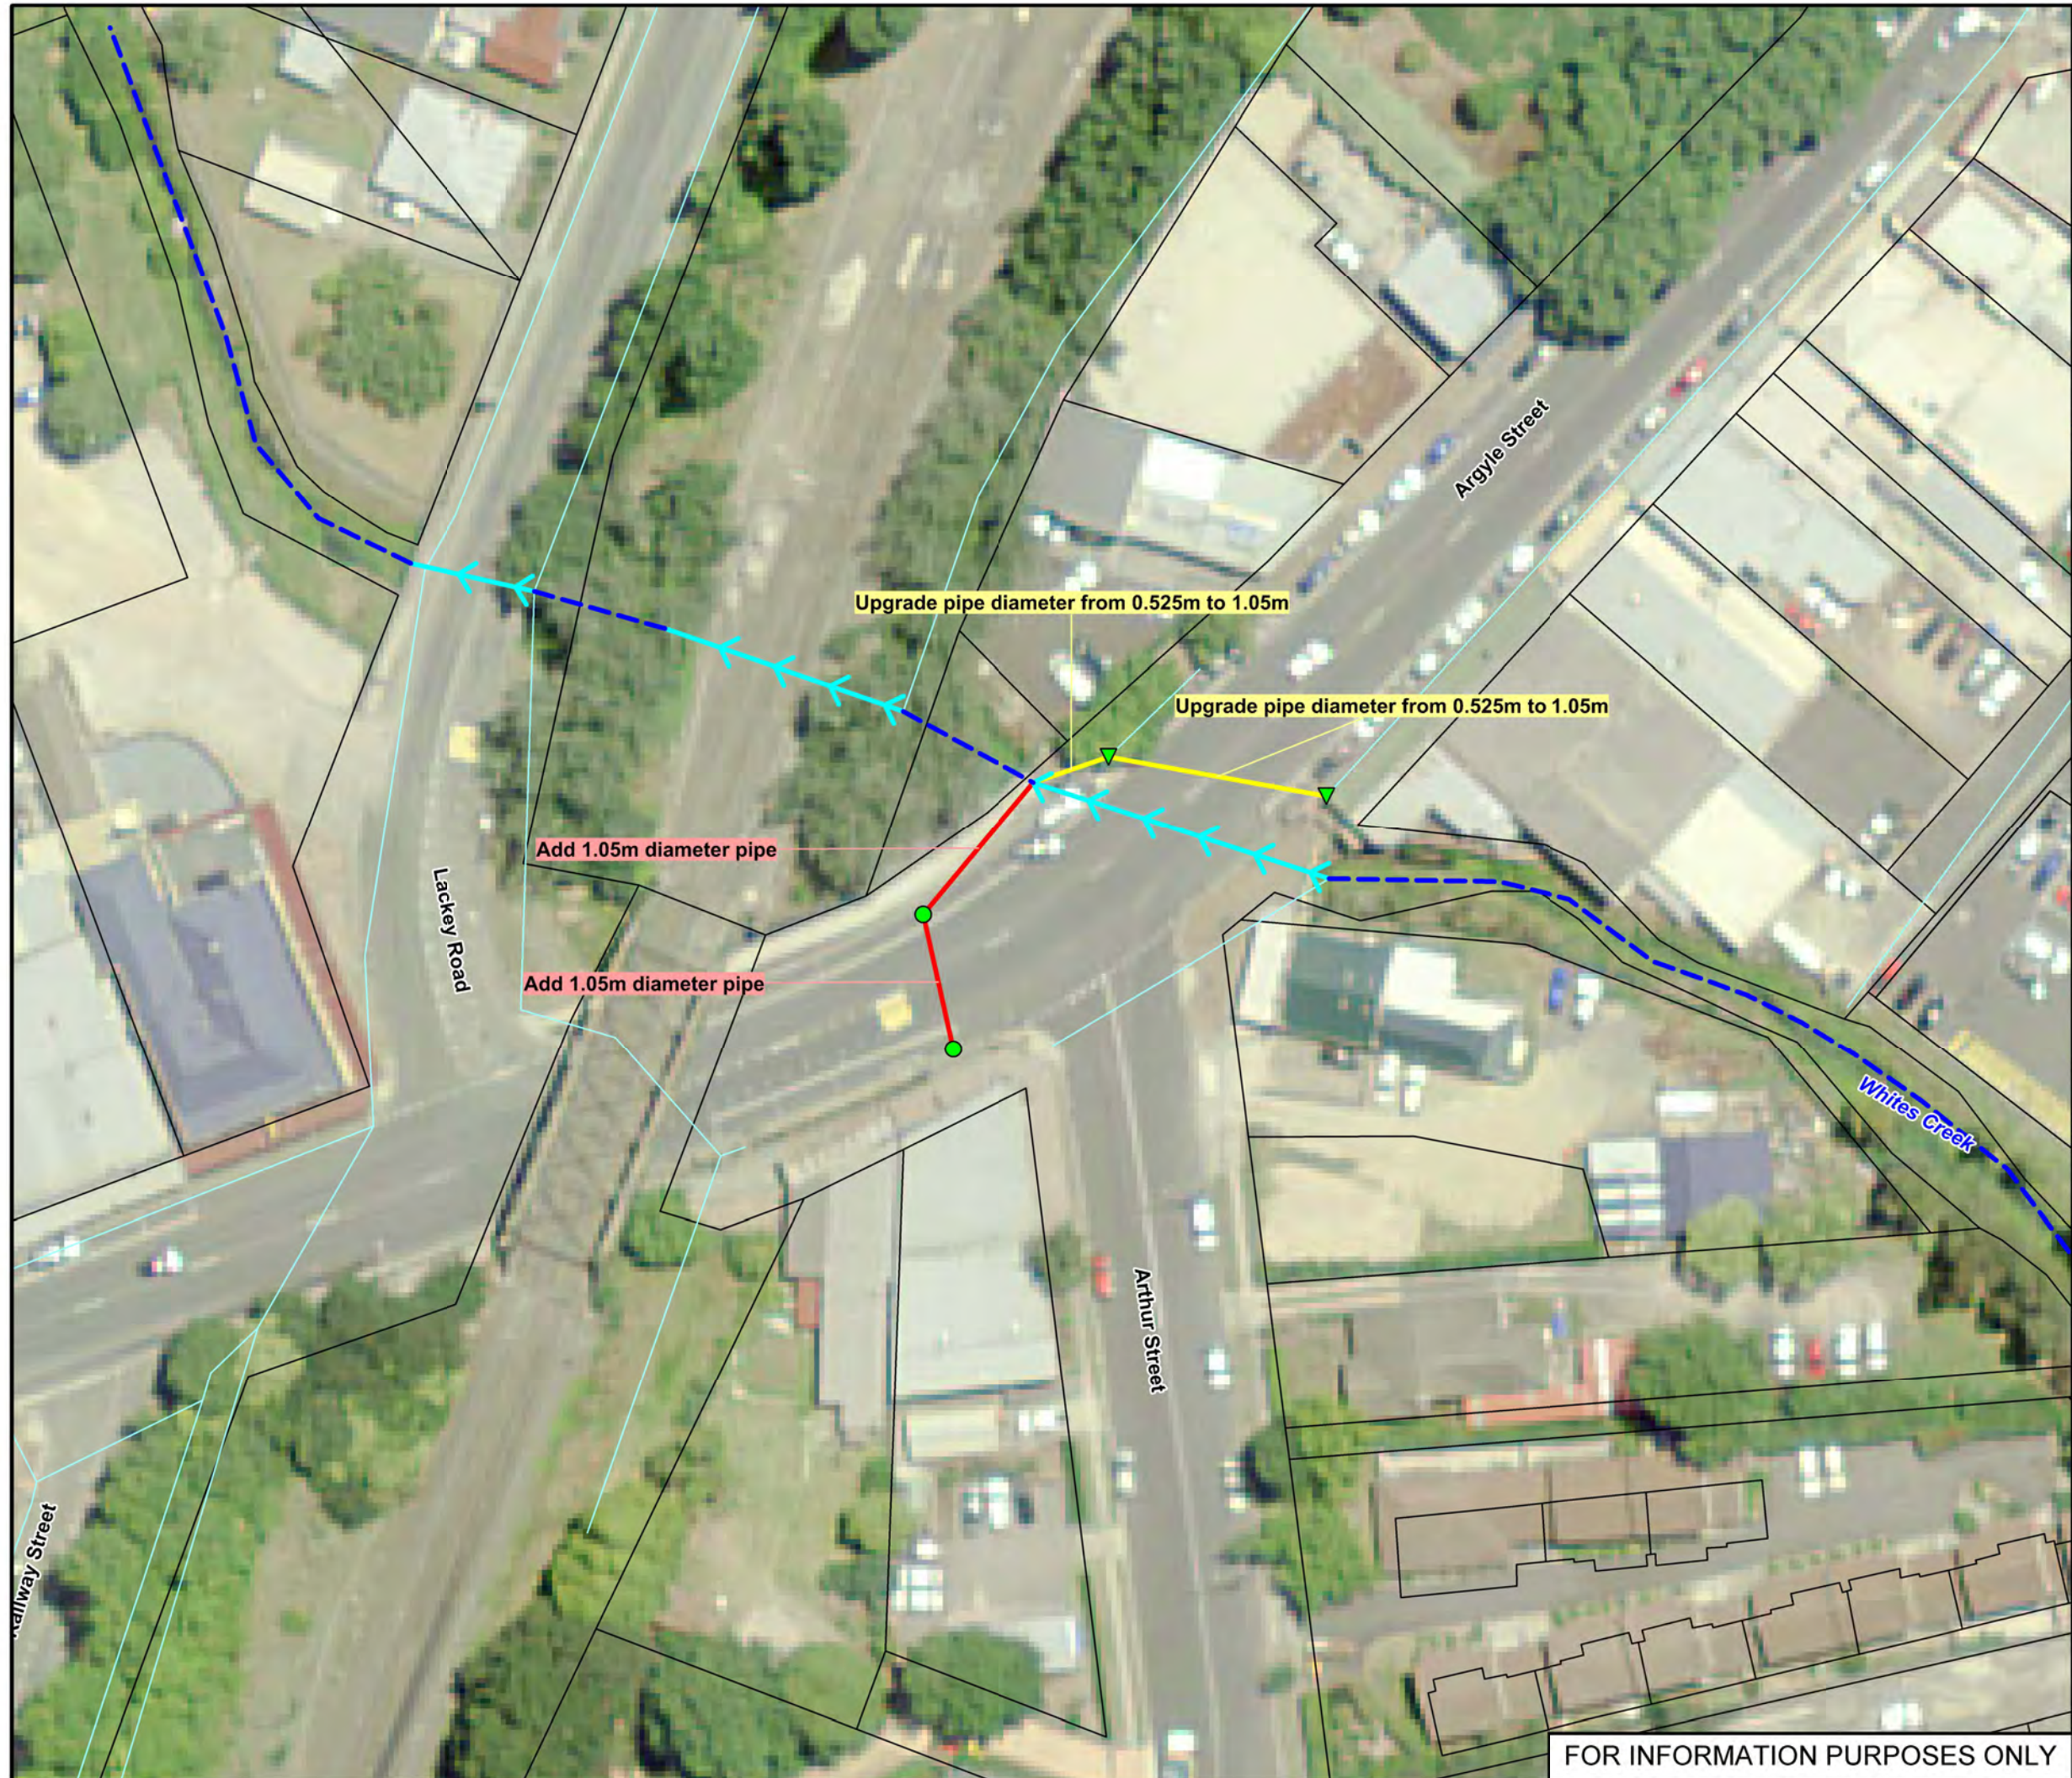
Concept Design to Upgrade Stormwater System along Railway Street (near Argyle Street) (FM3)
